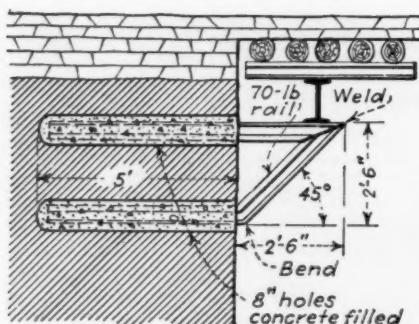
Shoulder brace used in timbering where roof loads are heavy.
